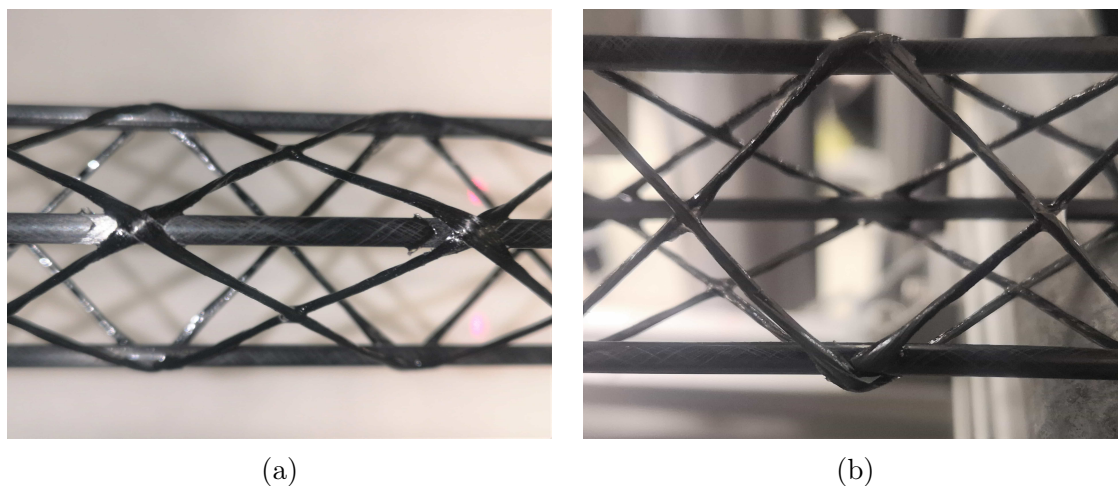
Joint failure: a) shearing of upper joints; b) debonding of lower joint.
